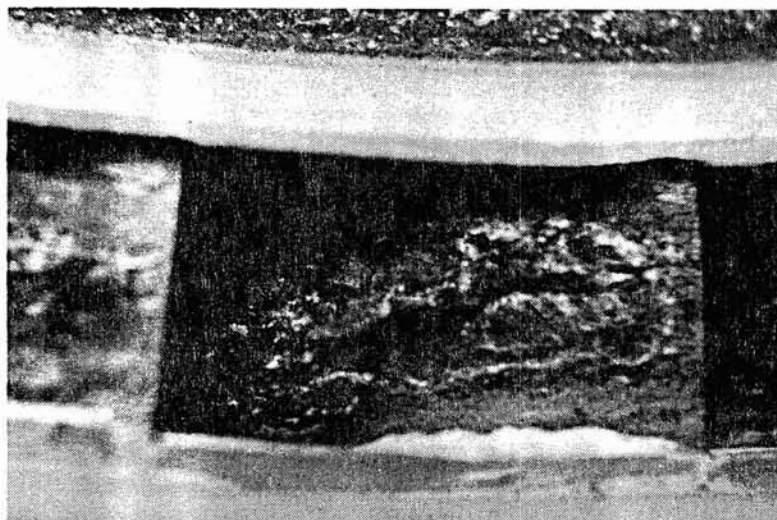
Diaphragm #1 Outlet Side - Top Section
